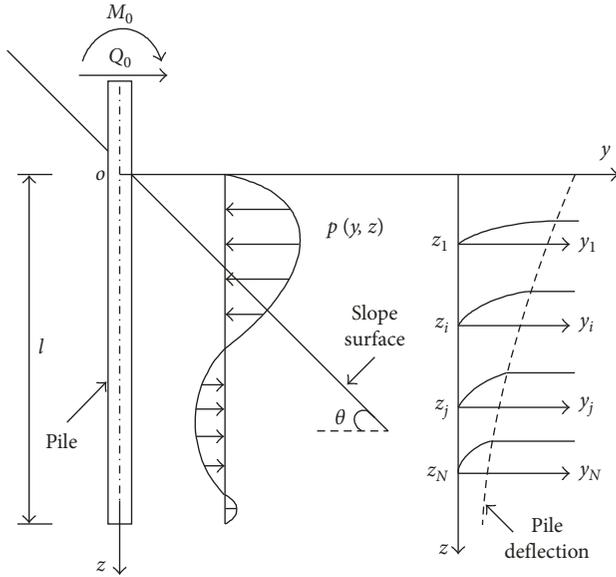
Simplified p - y model of laterally loaded piles in sloping ground.
